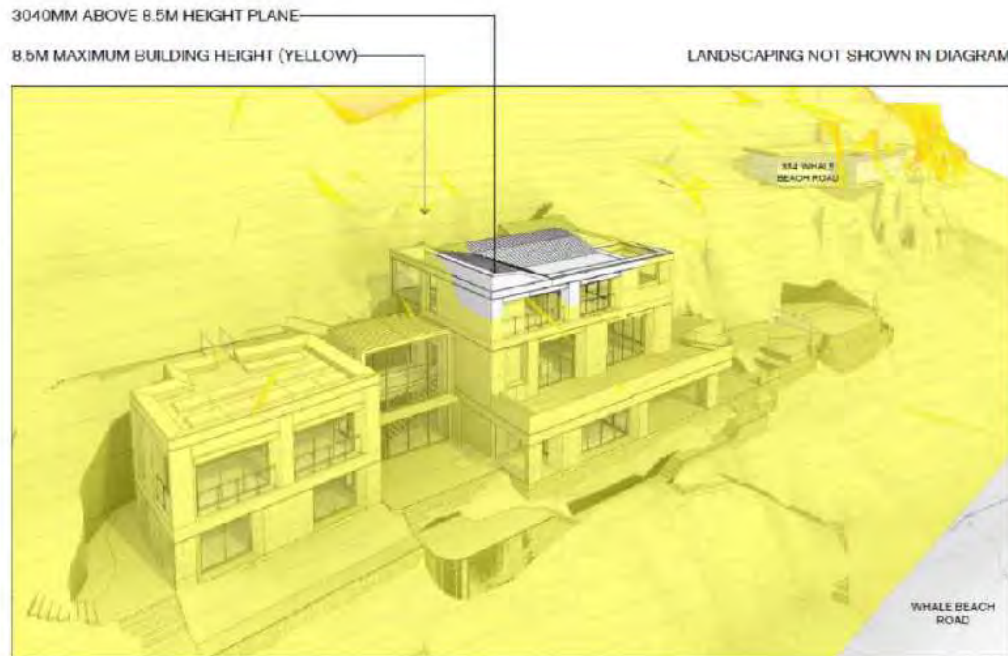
Extract of 3D View of Proposal with 8.5m Maximum Building Height Plane (Source: Tzannes)
